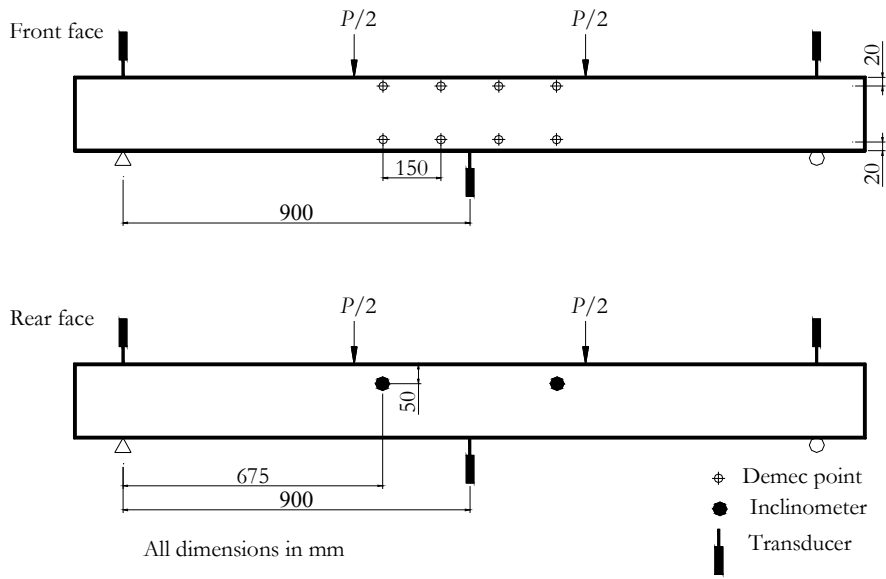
Instrumentation details for beam C2-216-D1-A.
